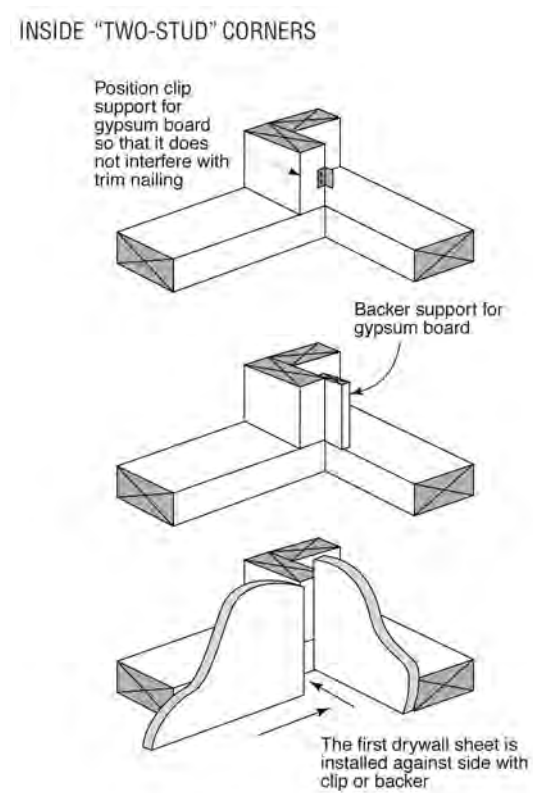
Inside two-stud corners are just as easy for hanging drywall, and they use less lumber. Drawing adapted from Building Science Corporation.
